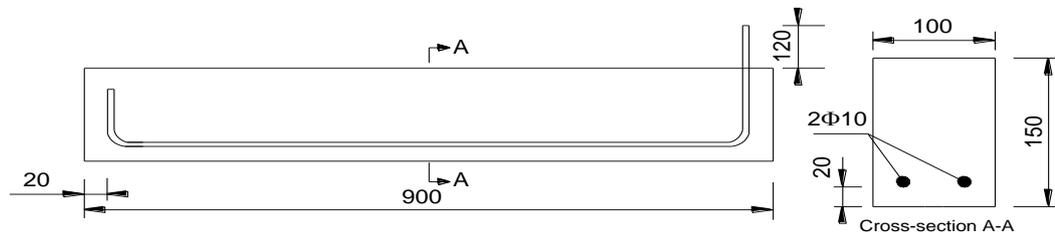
Detailed dimensions of beam specimens (All dimensions in mm)
